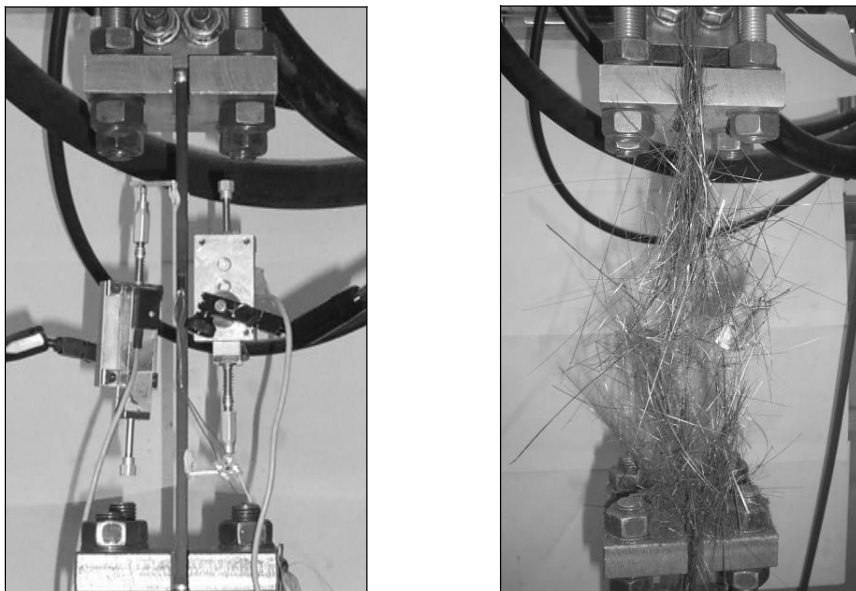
Left: Rod in test machine with attached sensors; Right: Rod after failure
